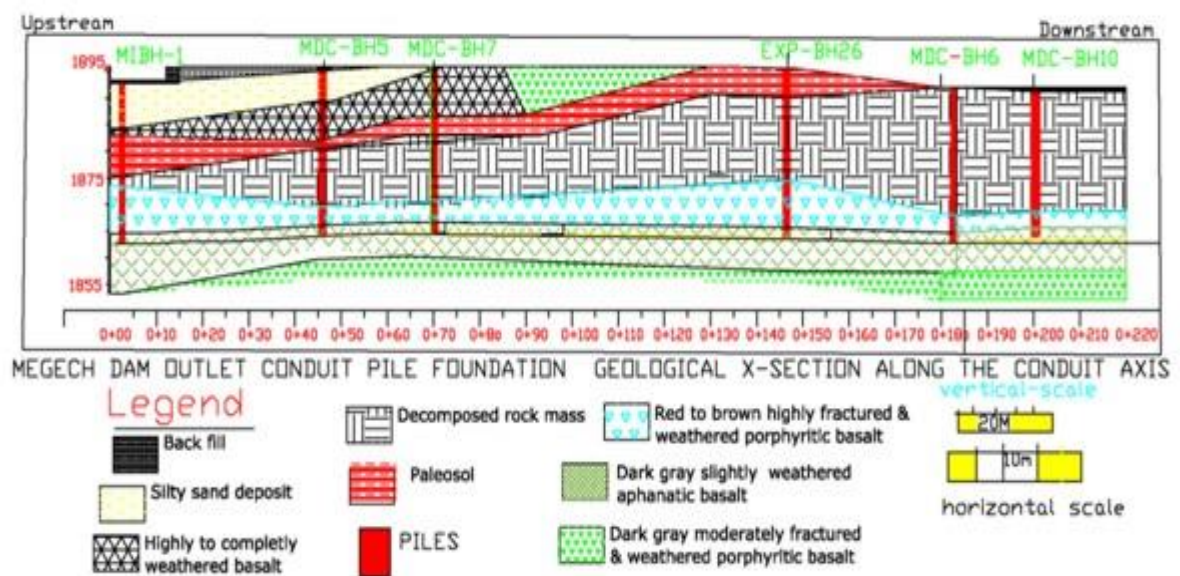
Geological cross-section along outlet conduit structure with selected piles
